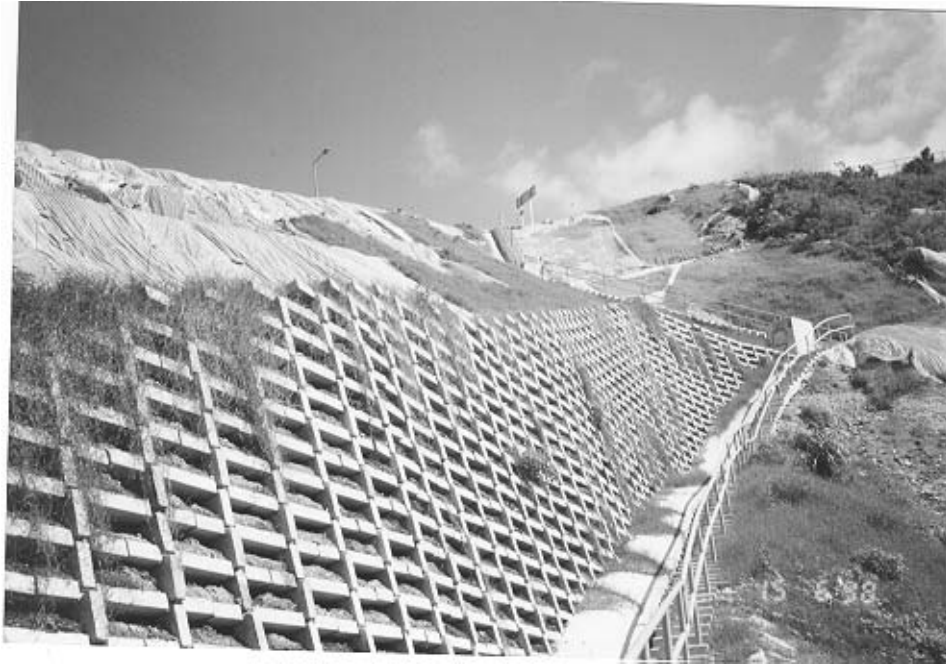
Event No. 3: 9 June 1998. View North Along Crib Wall at Toe of Slope A. (Photograph Taken on 15 June 1998)
